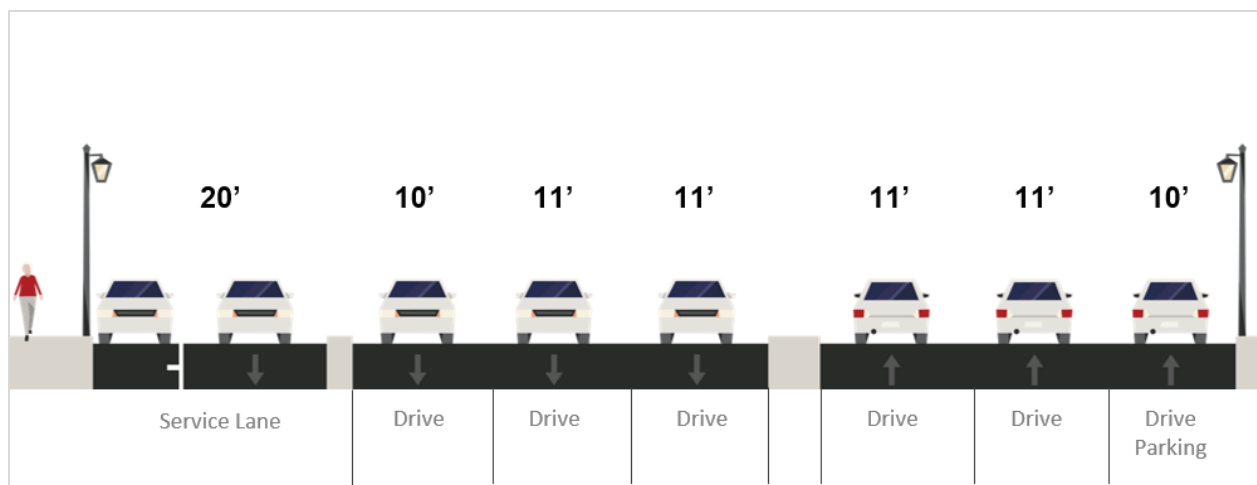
Typical section, existing condition, Rock Creek Trail to New Hampshire Ave NW
